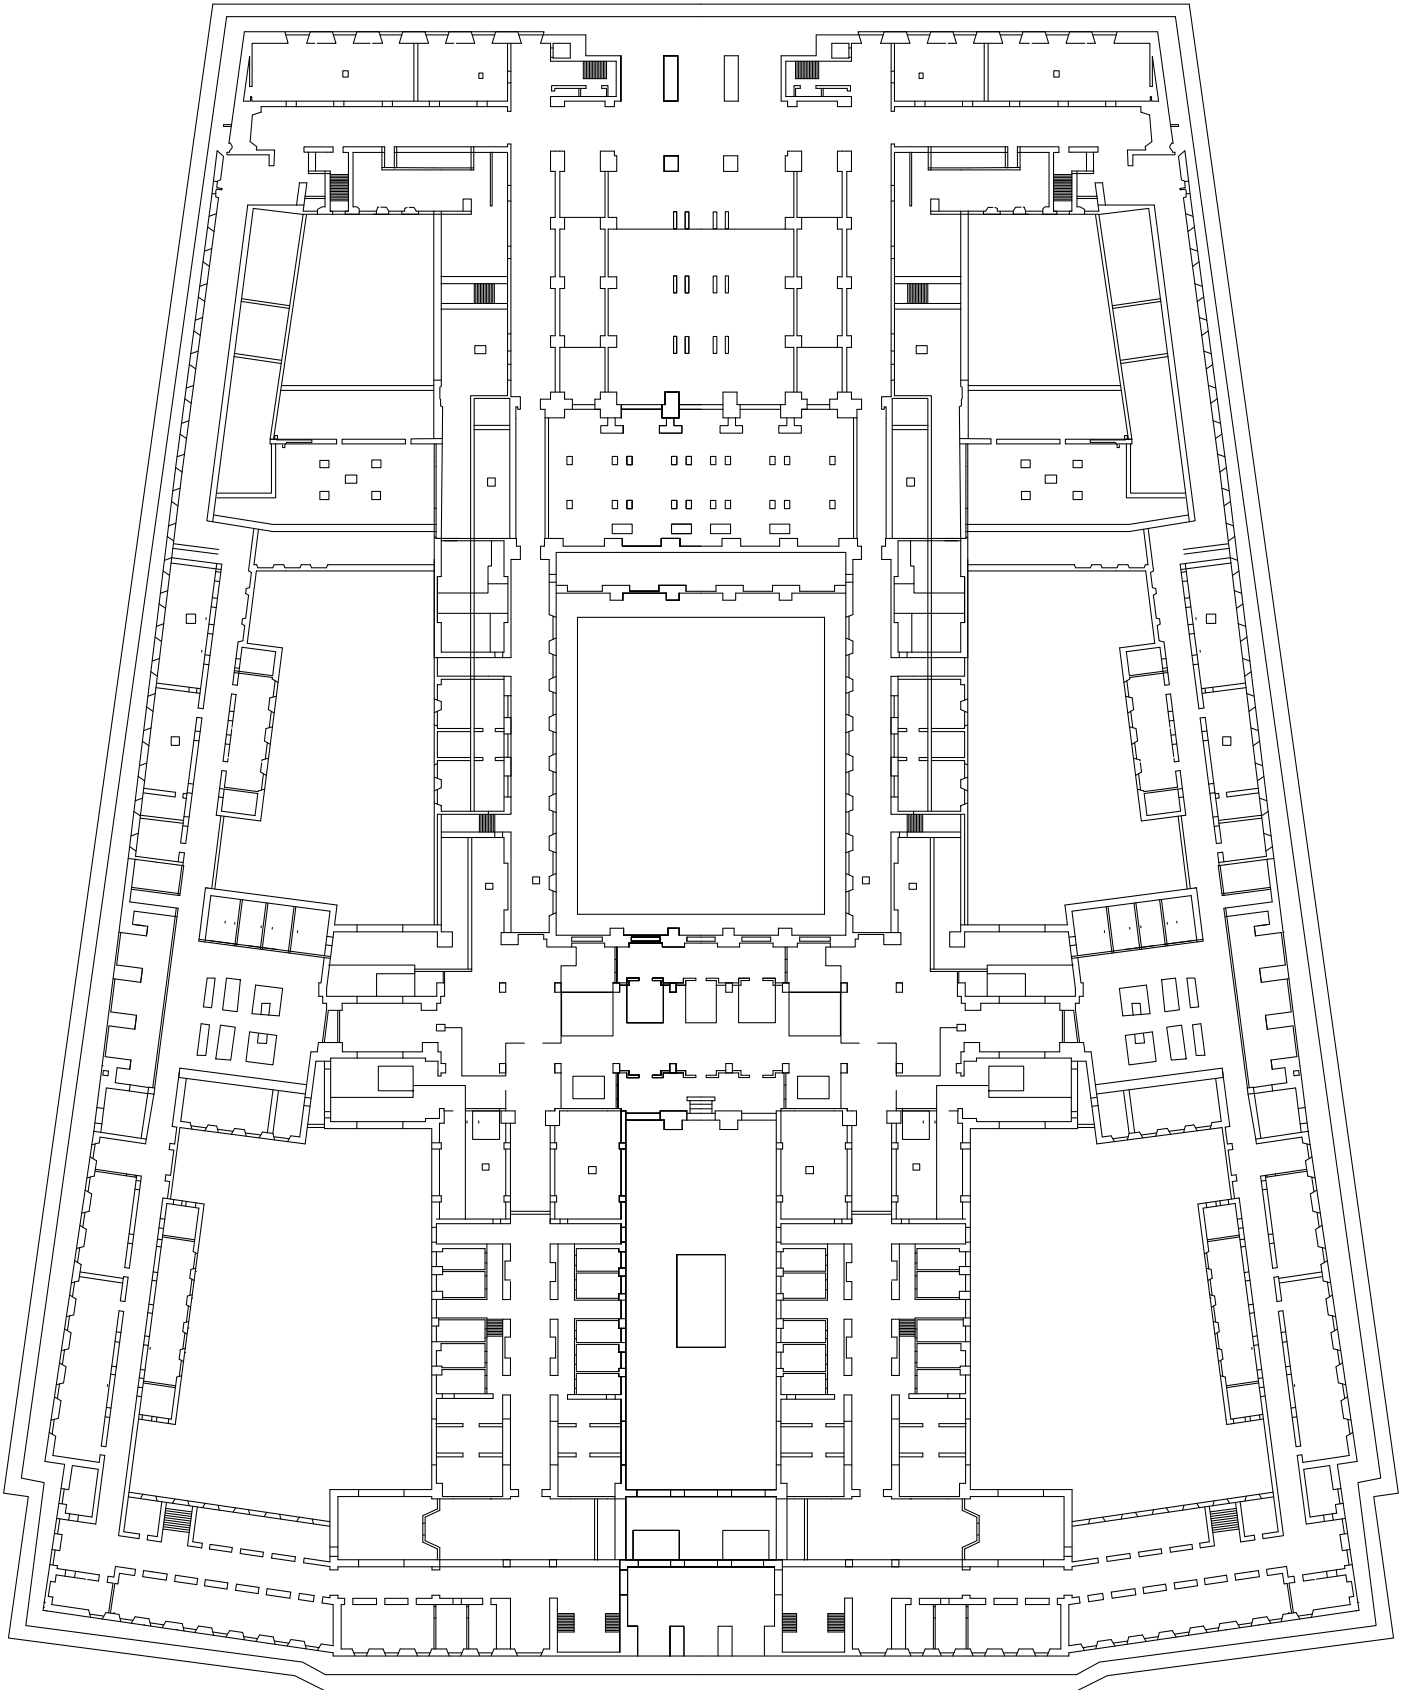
Basement Floor Plan, 4 m below the road level.
